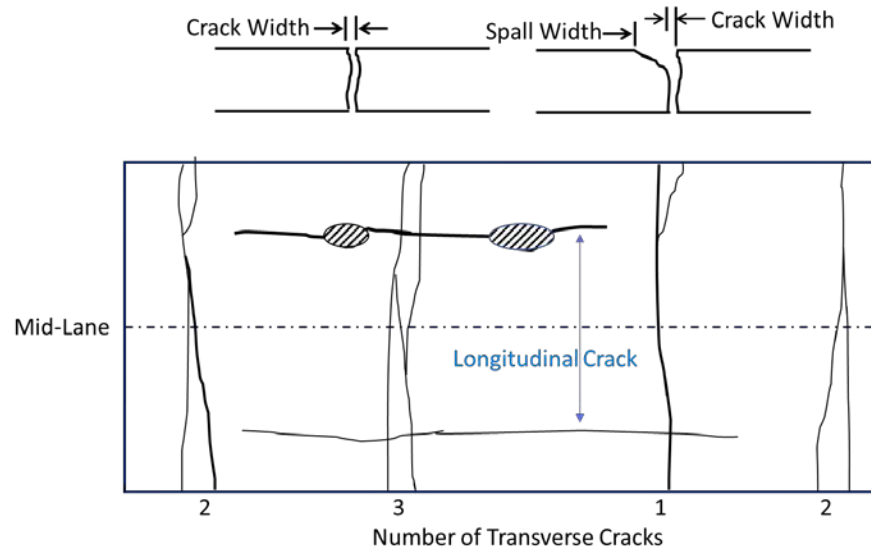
Schematics of transverse and longitudinal cracks, including spalling.
